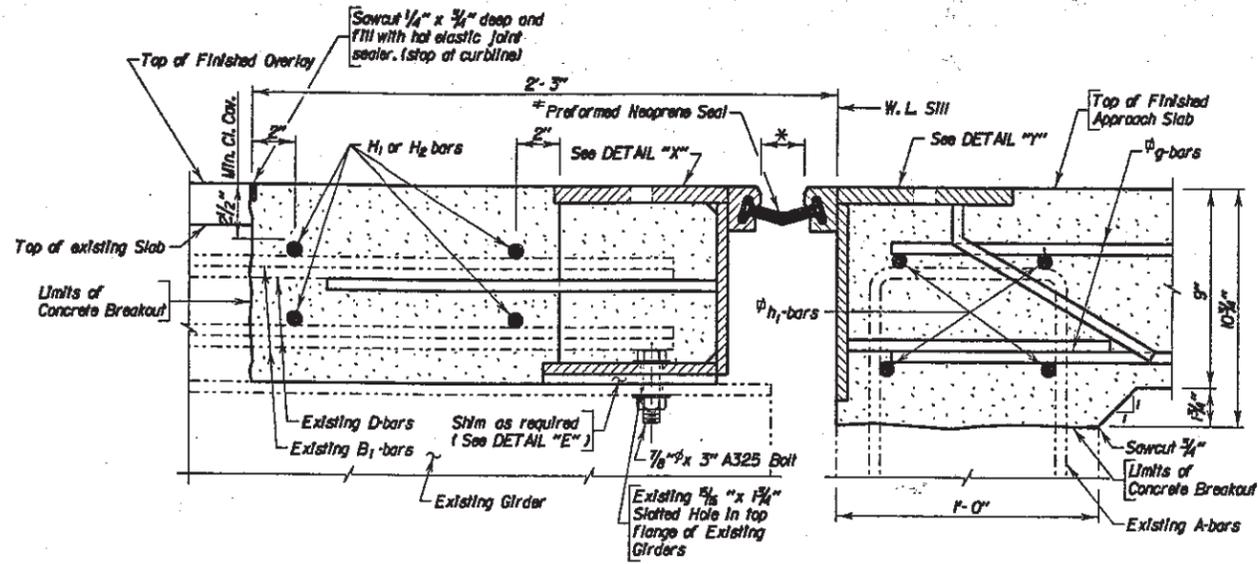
DETAILS OF APPROACH SLAB ADJACENT TO "ON END" OF BRIDGE FOR 135'-8" I-BEAM VIADUCT
